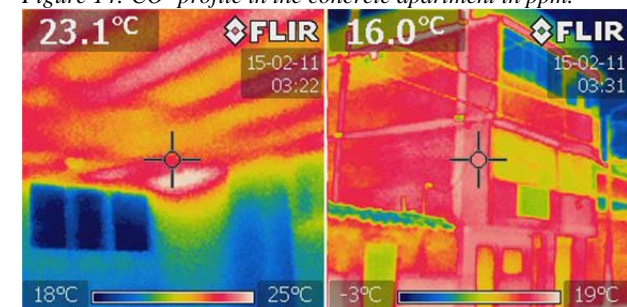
Ceiling showing concrete beams store and emit heat after nightfall (left). The concrete structure (columns and beams) stores the most heat (right).
